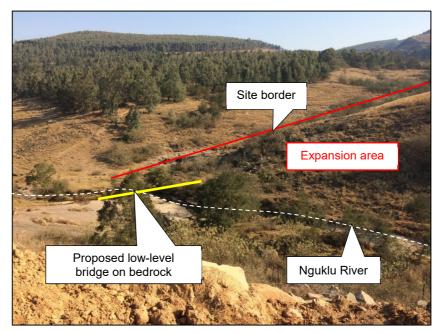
Location of proposed low-level bridge crossing - southern end of site
